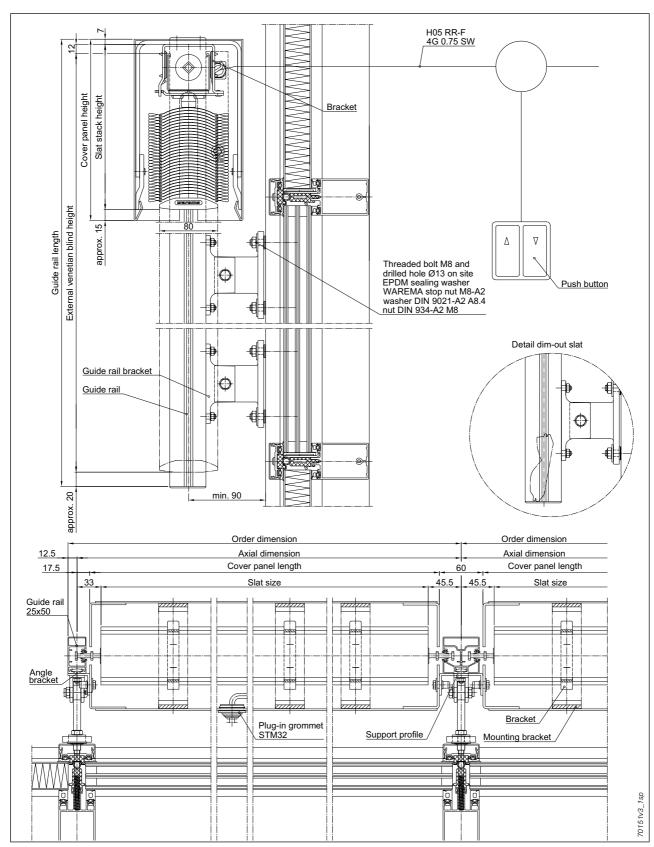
Mounting example for external venetian blind E 80 A6 S with guide rail 50x50 mm or 25x25 mm: mounting cover panels between guide rails
